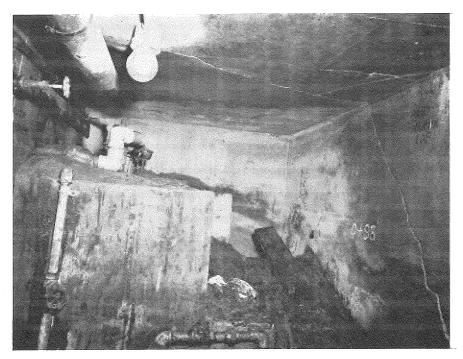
West end of drainage inspection chamber, showing crack at Station 0+89, drains, and weir box, December 20, 1963
